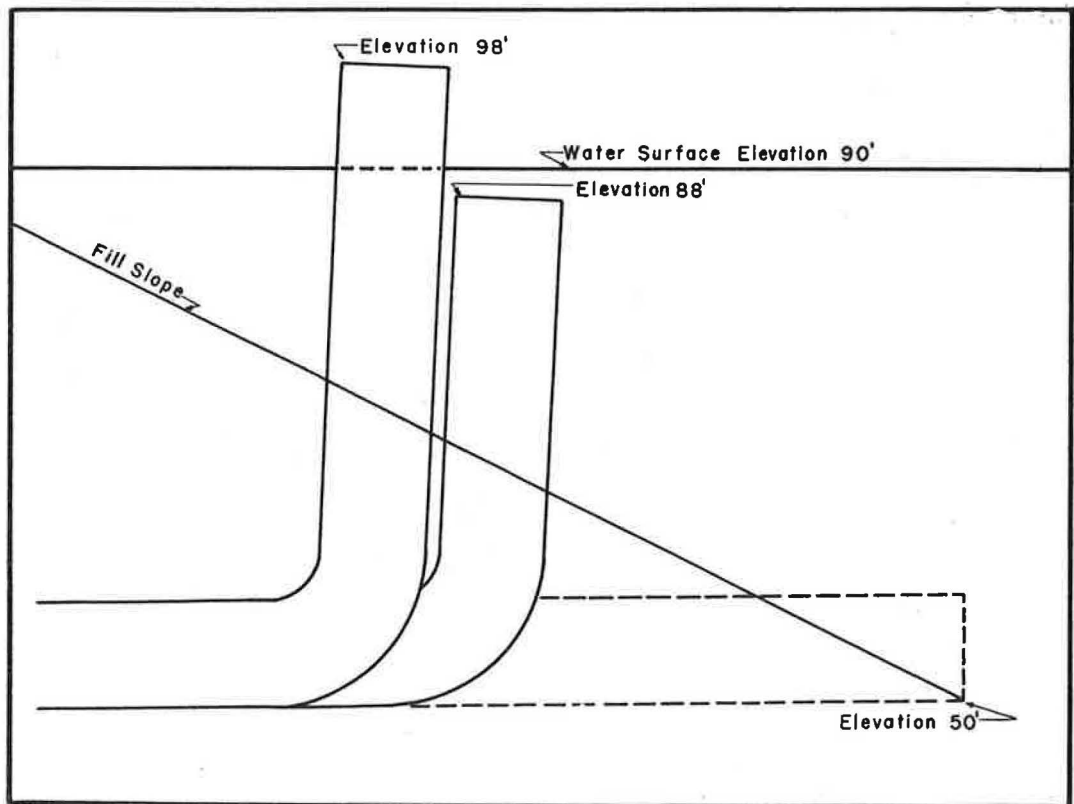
Schematic sketch of Burnt Hill culverts failure.
